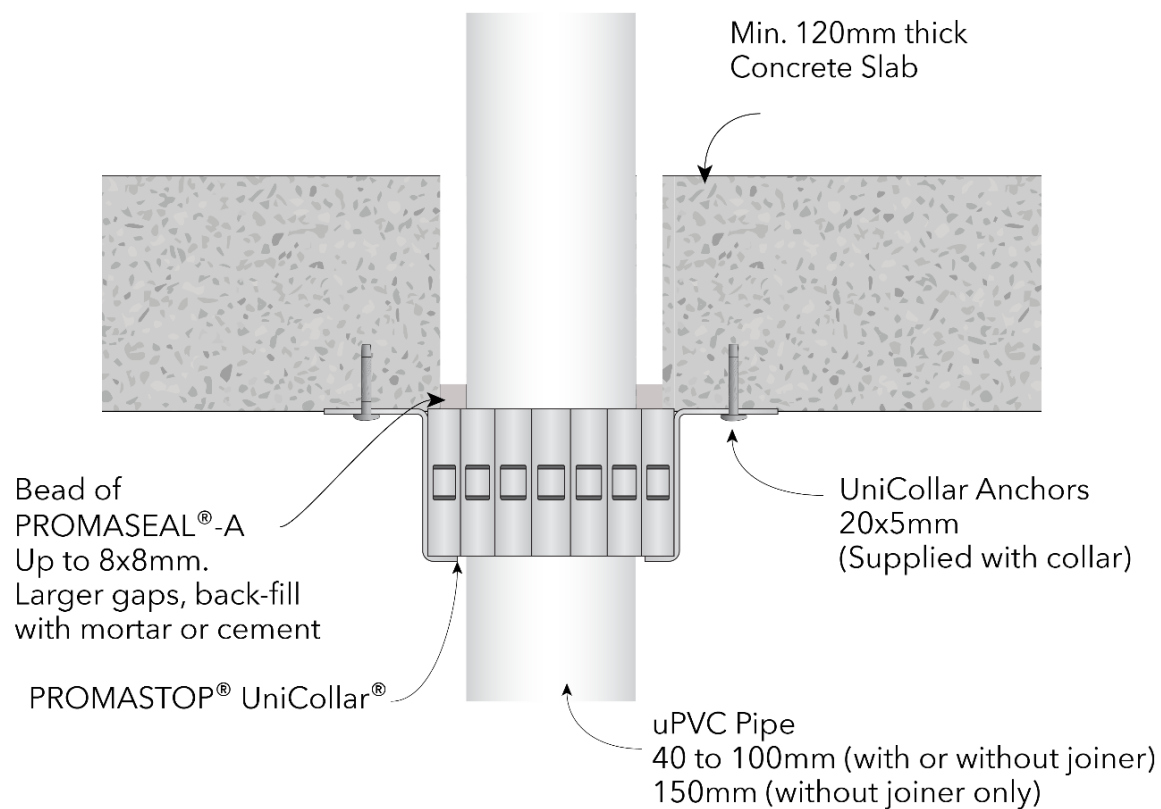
Cross sectional view of uPVC pipe penetrating 120 mm thick concrete slab protected by PROMASTOP® UniCollar®
